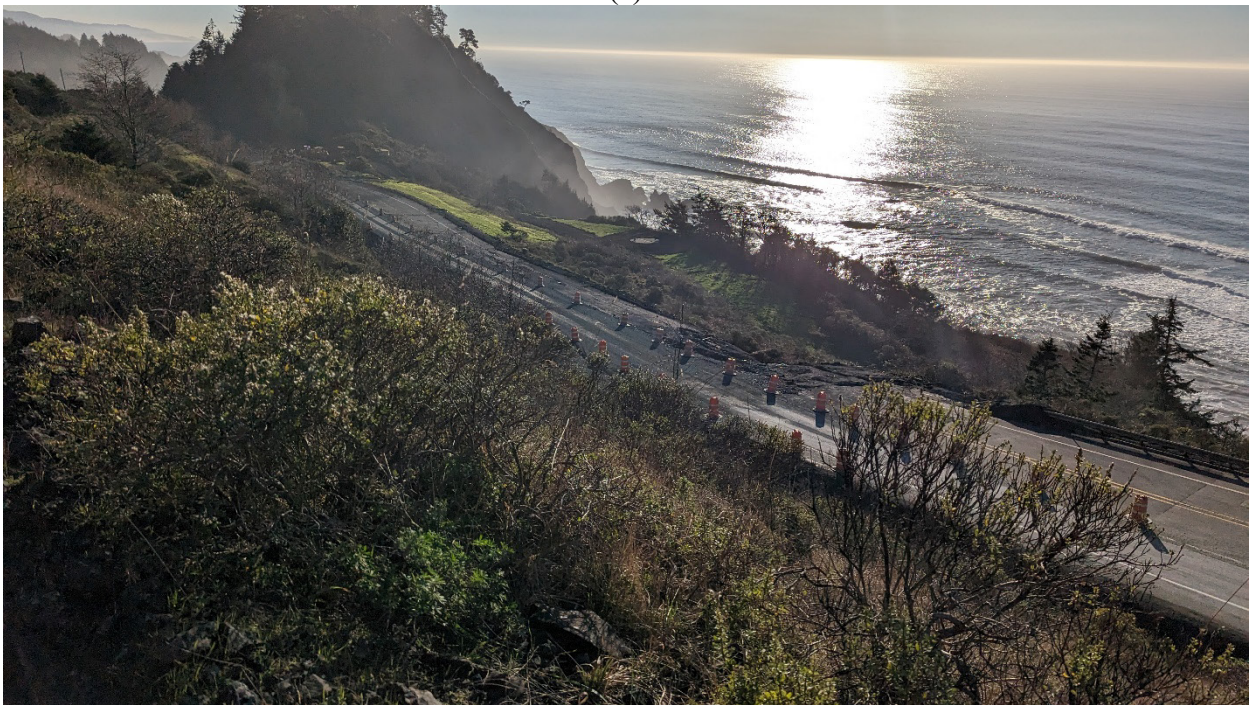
Shifts observed in guardrail and additional cracking (Photograph looking southeast, immediately west of the highway southbound lane & shoulder, July 2022)
